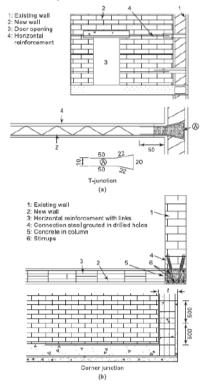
Connection of new and old brick walls Strengthening existing walls
